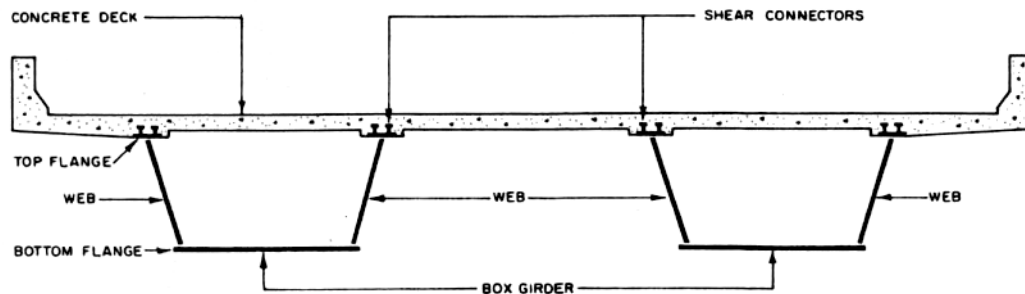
Cross section of the composite steel box girder (US Steel, 1978)
